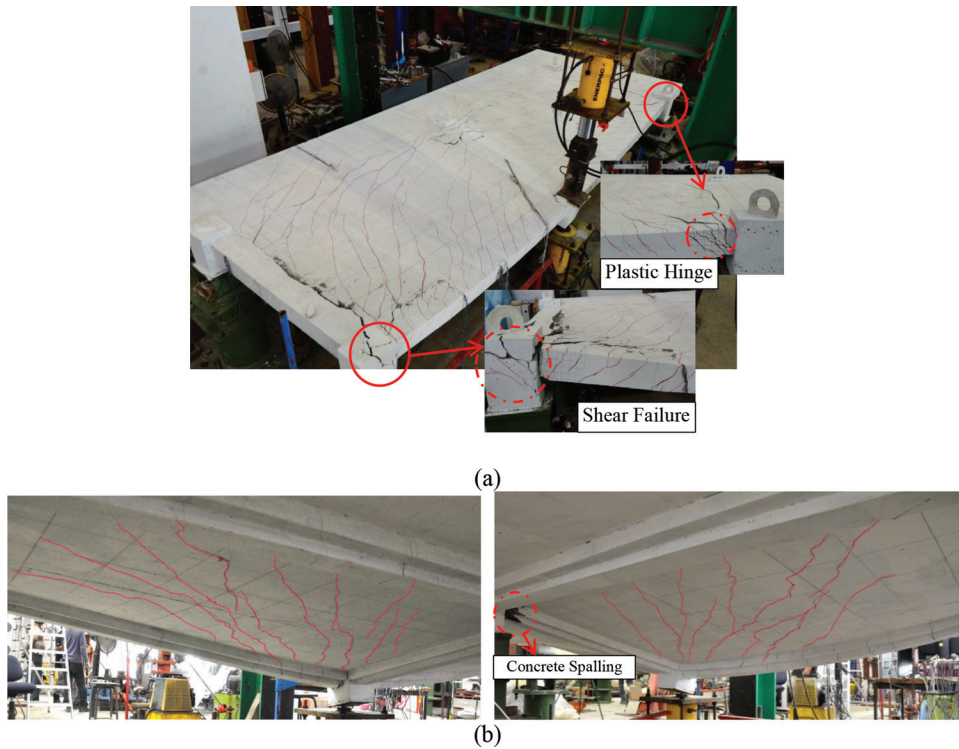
Failure mode of Specimen RC1: (a) top view; and (b) bottom view.
